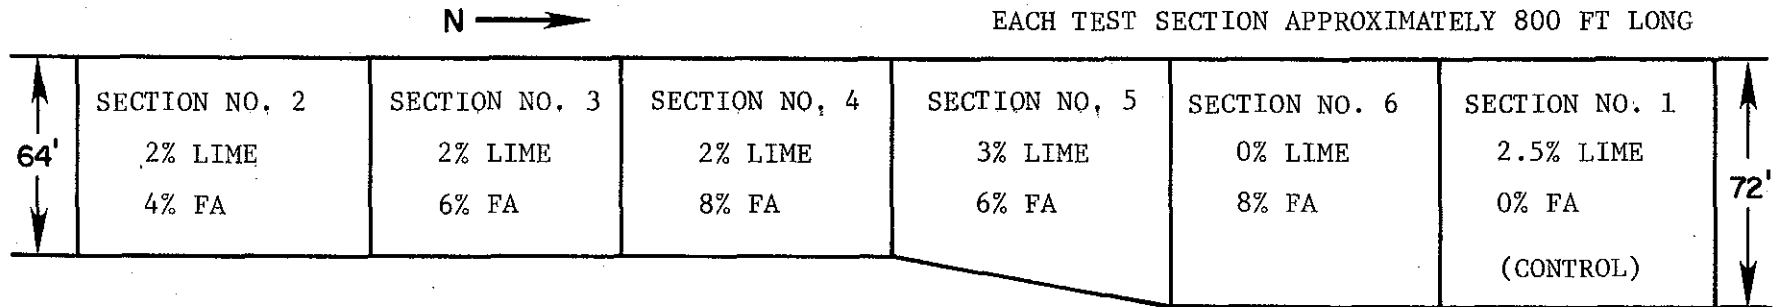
Typical section and layout planview of test sections on westbound lane of FM 1604 in Bexar County, Texas - Site No. 5 (6).
